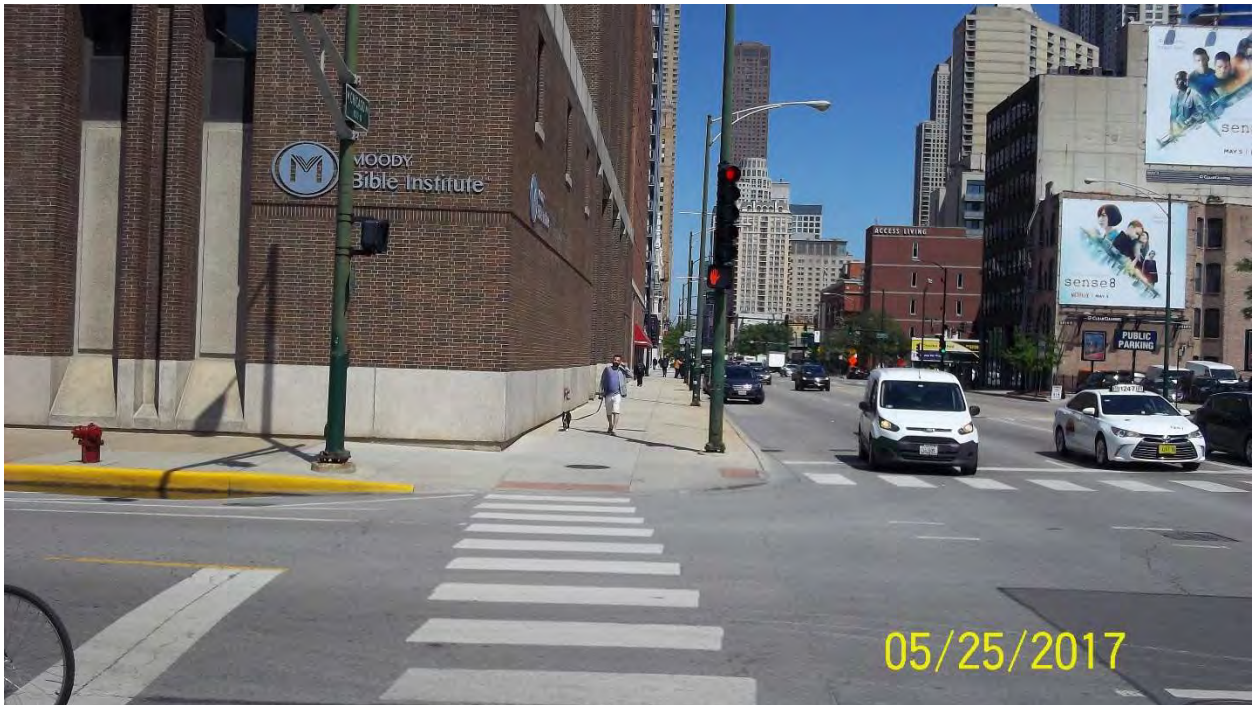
Northwest corner of Chicago Ave. / Wells St. – Looking East
